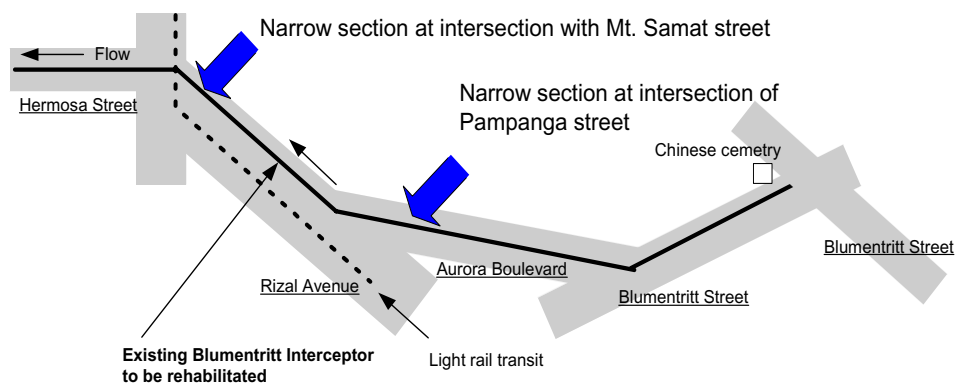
Locations of Narrow Section of Existing Box Culvert
